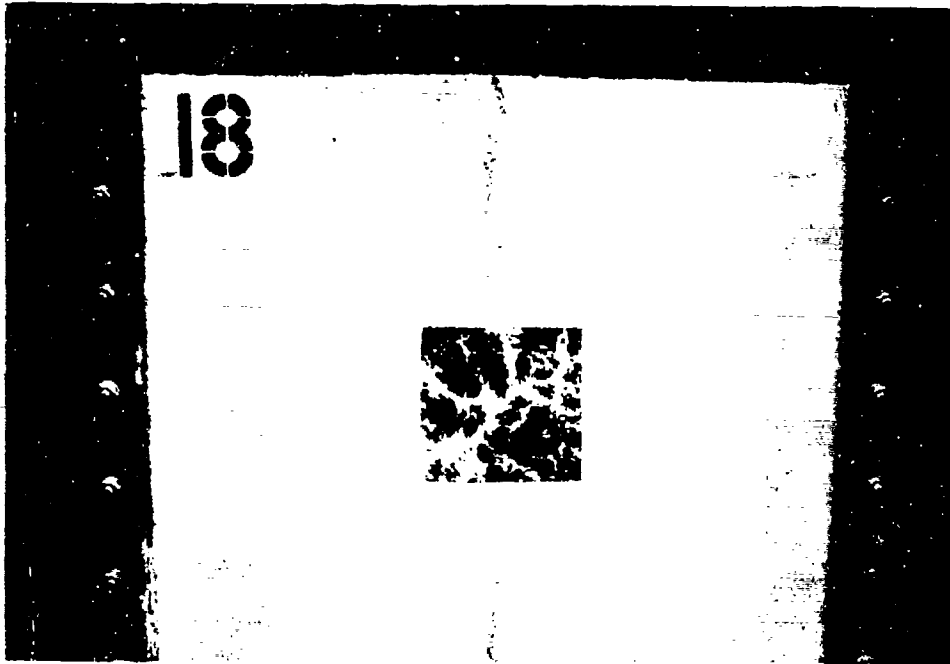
Test 18 Wall Damage (Type C, 2.4-Pound Equivalent Charge).
